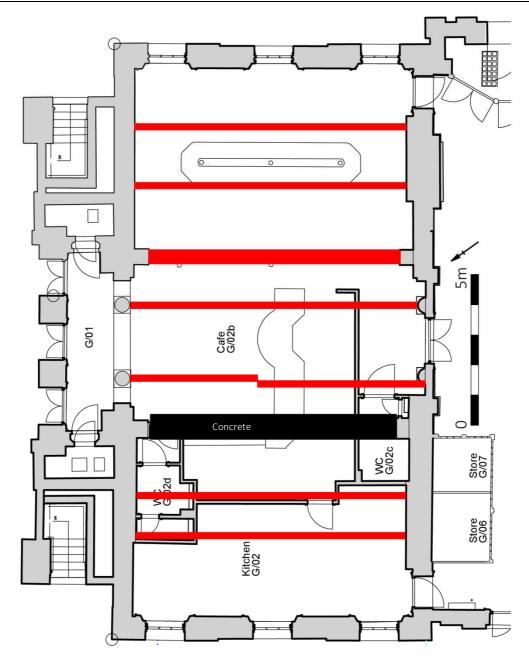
Supporting walls below the coffee shop floor (Scale 1:125)
